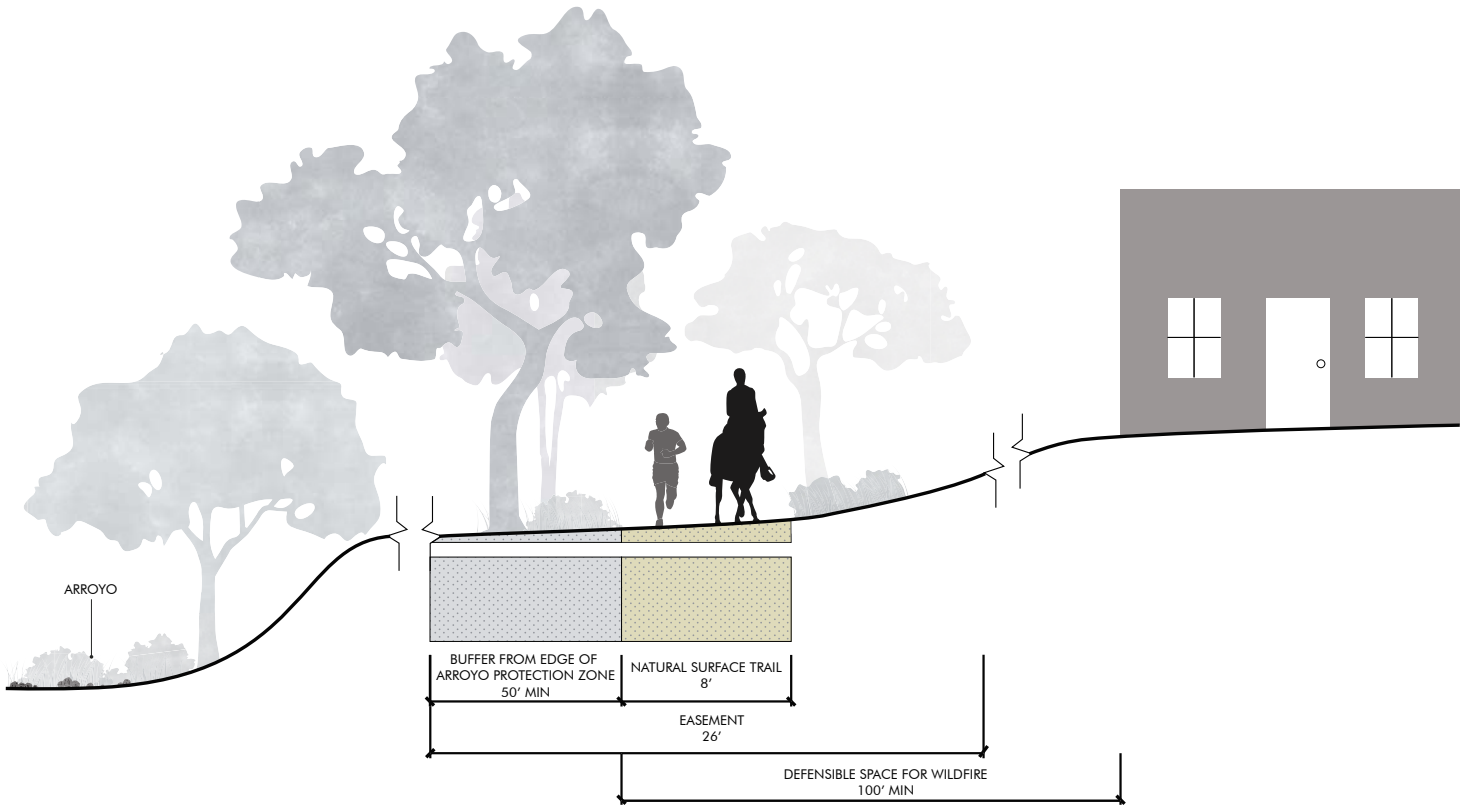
TYPICAL SECTION: OPEN SPACE (MID-COUNTRY)
